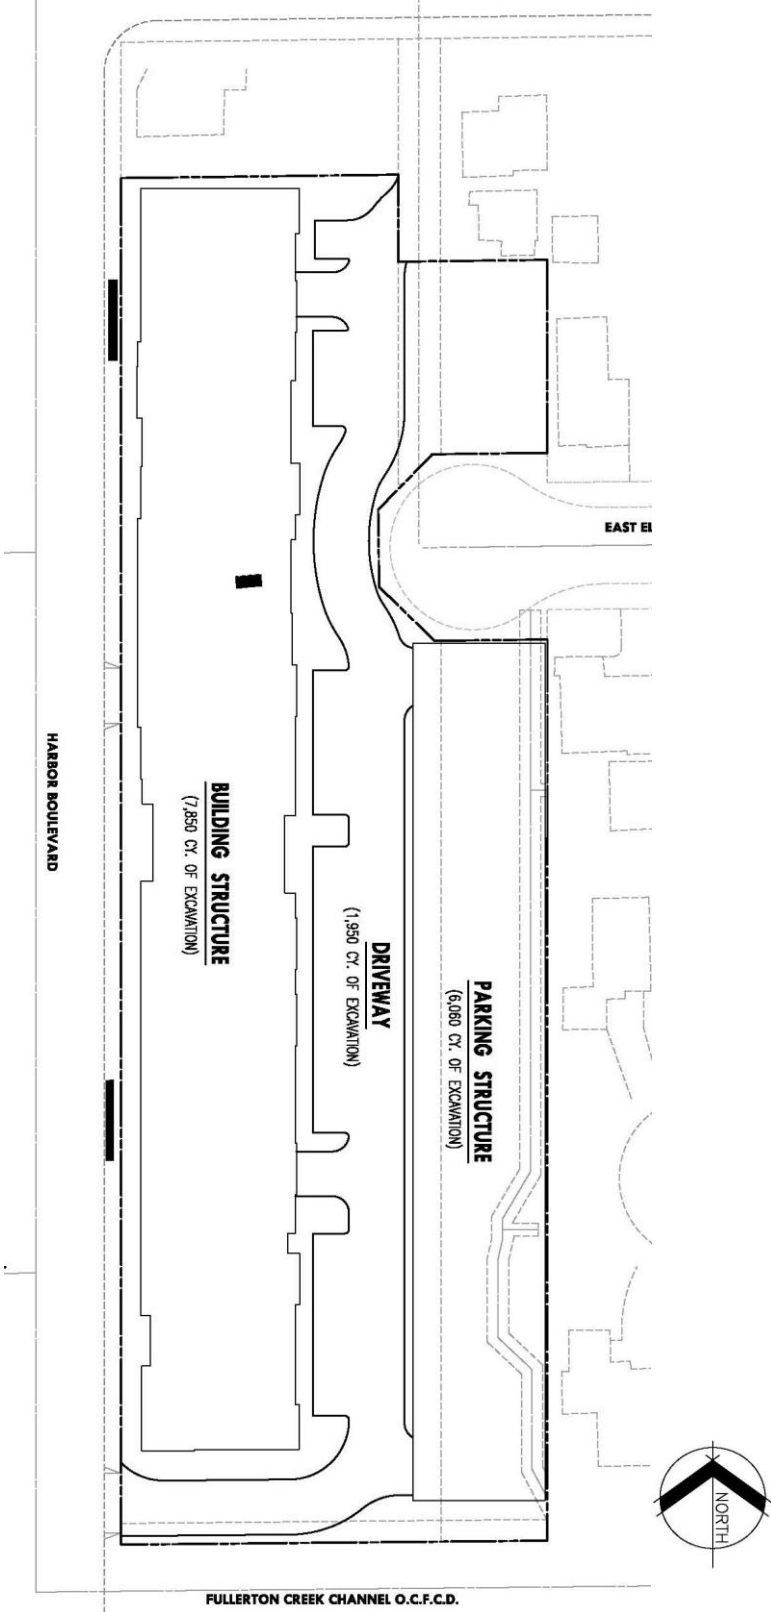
CONCEPTUAL GRADING PLAN
